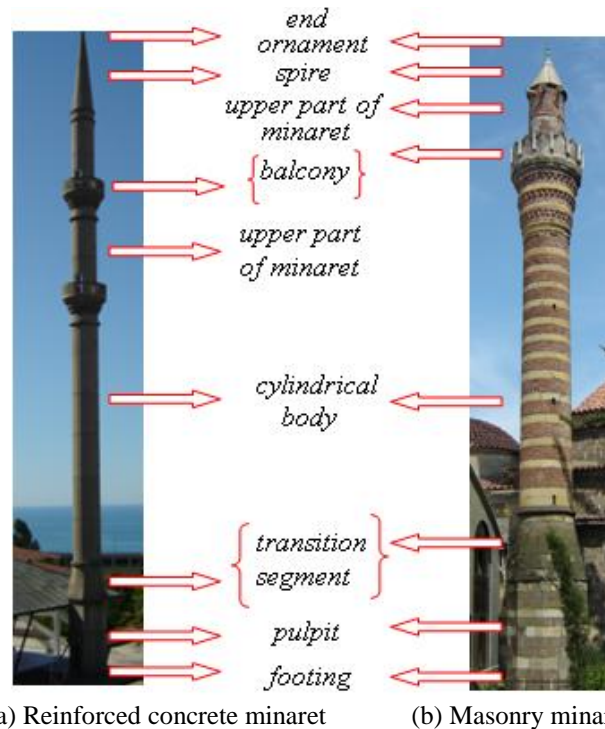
Typical reinforced concrete and masonry minarets in Turkey
